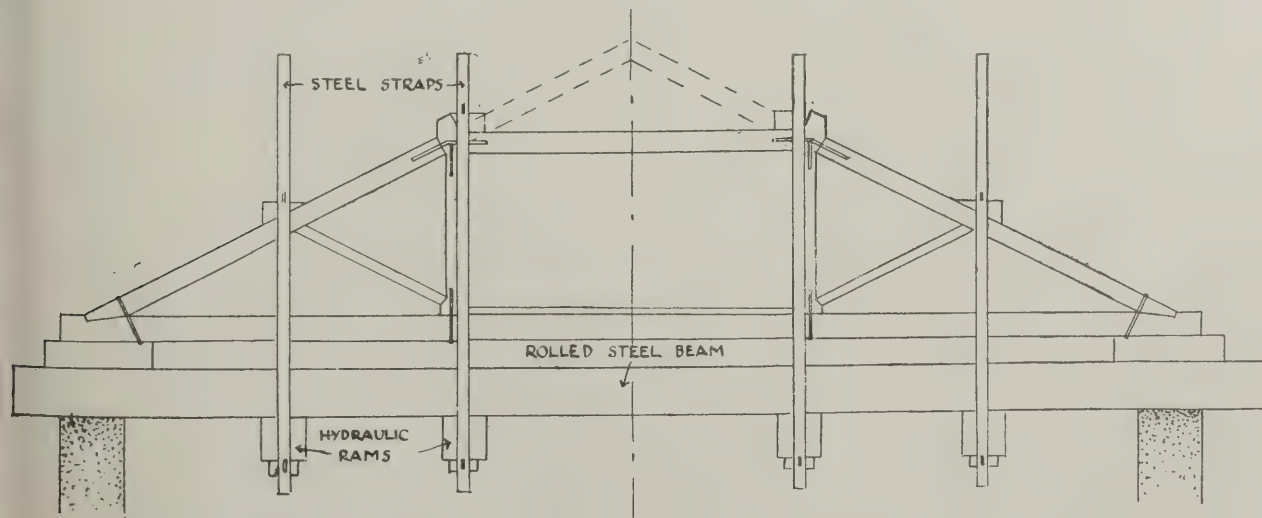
SHOWING HOW THE QUEEN-POST TRUSS WAS TESTED.
